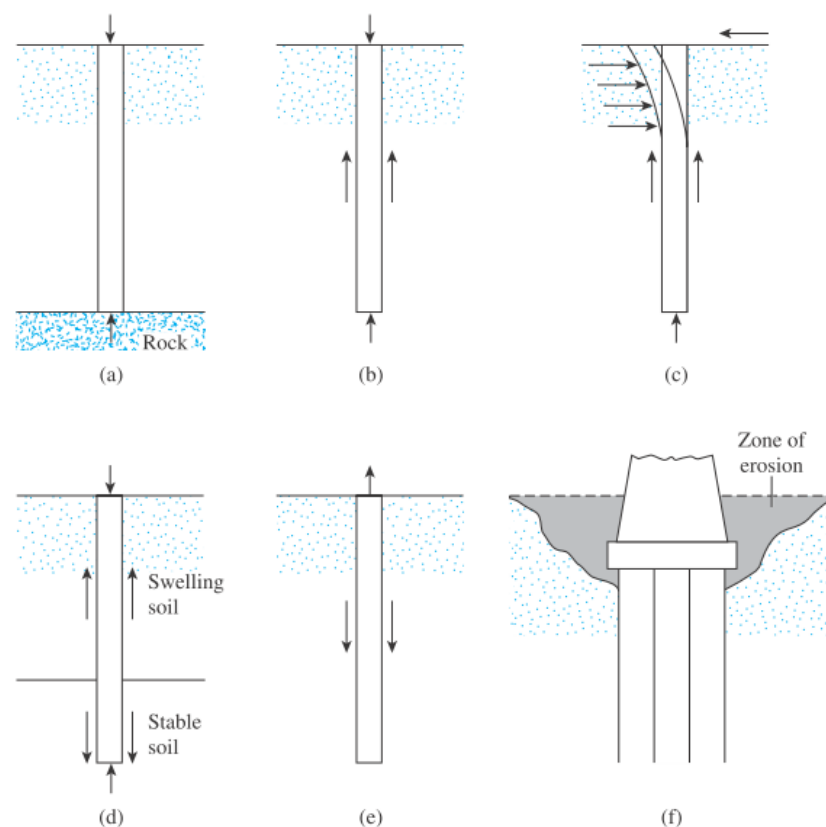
Conditions that required a pile foundation (Das, 2011)
